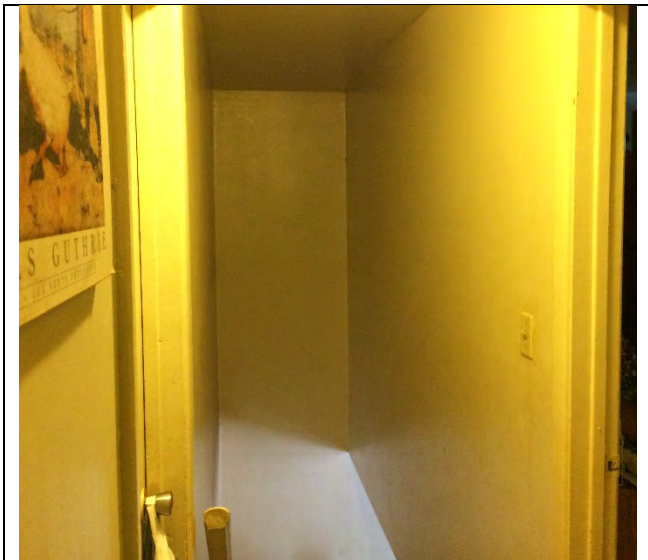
Asbestos-containing drywall joint-fill compound on the stairwell walls.
